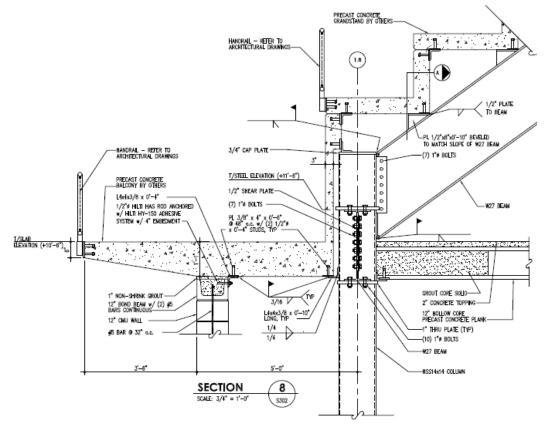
Section Showing the 12" Hollow Core Precast Concrete Plank, the Precast Concrete Balcony, and the W27x94 Beams Supporting the Concrete Grandstand
